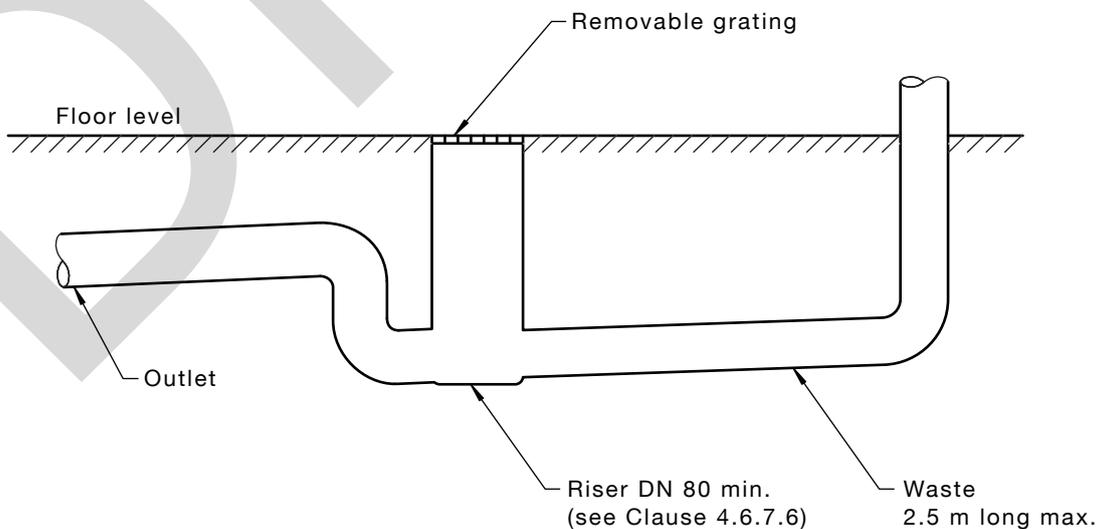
SUBMERGED ENTRY FLOOR WASTE GULLY
